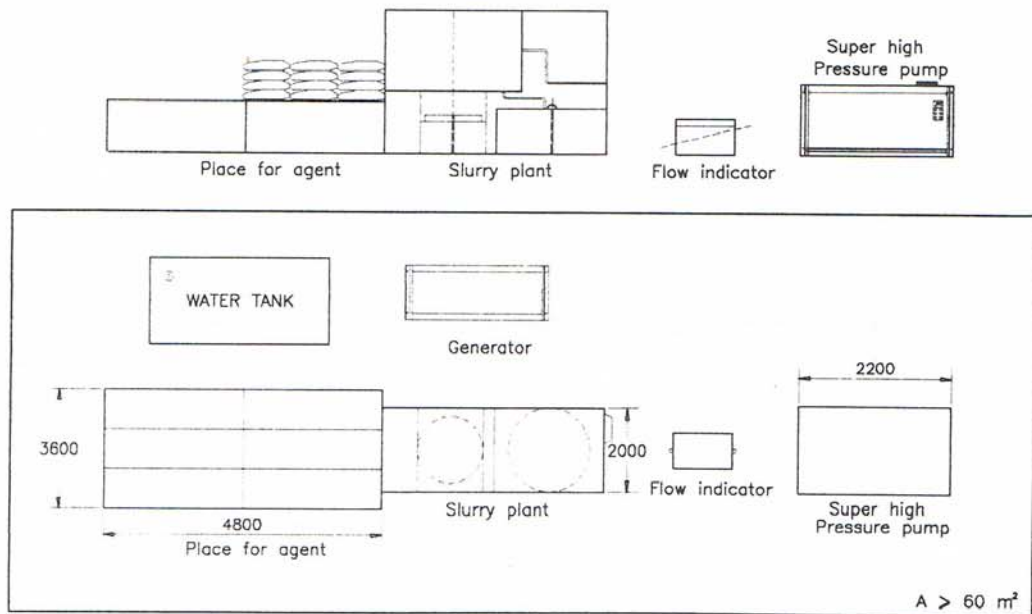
Arrangement of slurry plant using 1 machine
